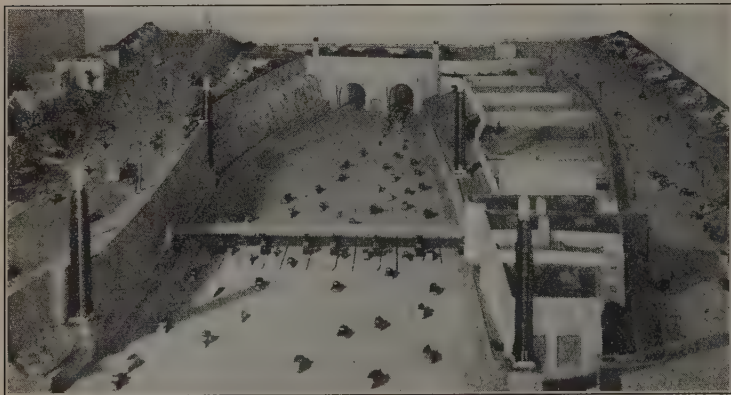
A MODEL OF THE NEW JERSEY APPROACH OF THE LINCOLN TUNNEL WHICH WAS USED IN STUDYING THE PLAZA FUNCTIONS OF TOLL COLLECTION AND LANE REDUCTION
